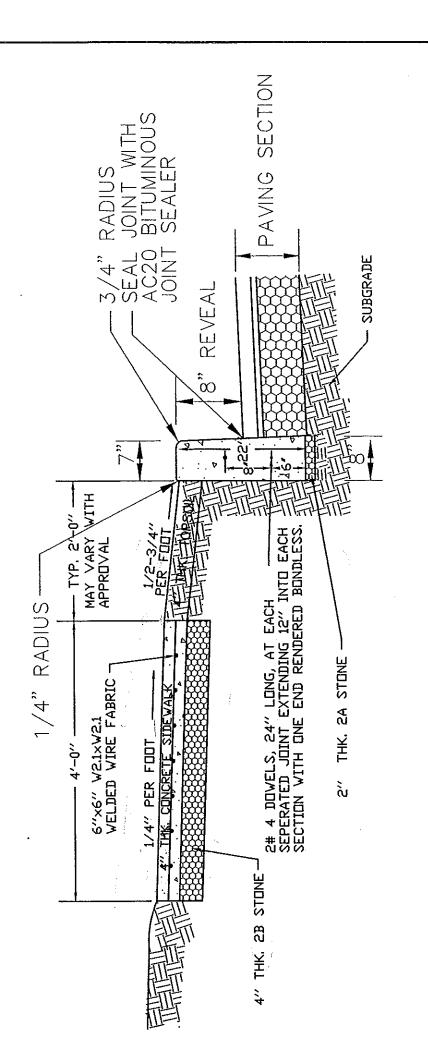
NOT TO SCALE SIDEWALK SECTION-CONCRETE CURB AND -CROSS
